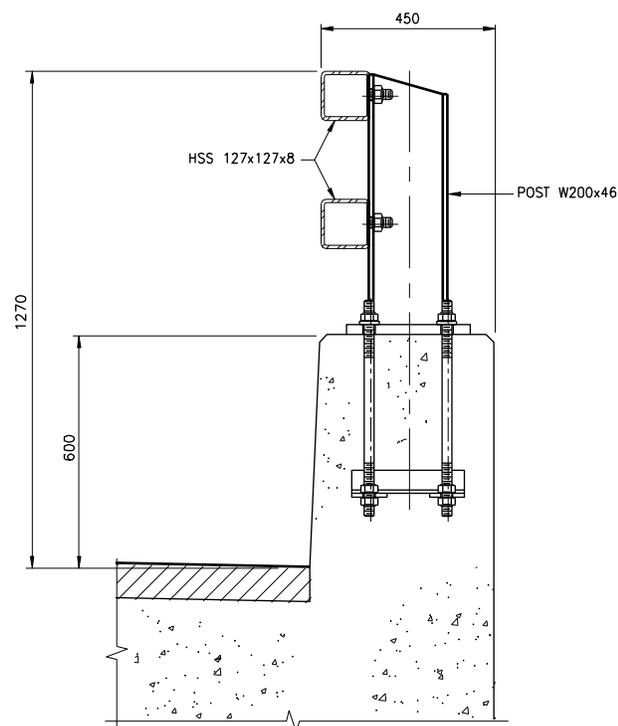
Parapet Wall with Two Tube Railing (TL-5)
